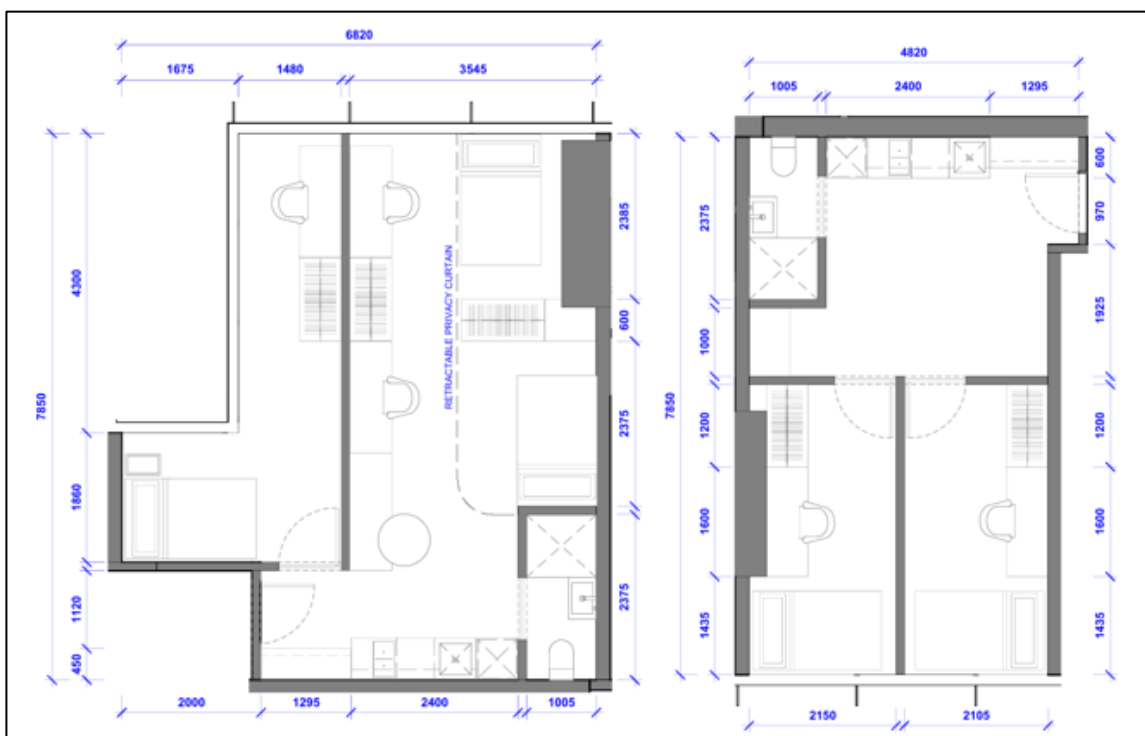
Three-bed room (left image) and two-bed room (right image) (Source: Application)
